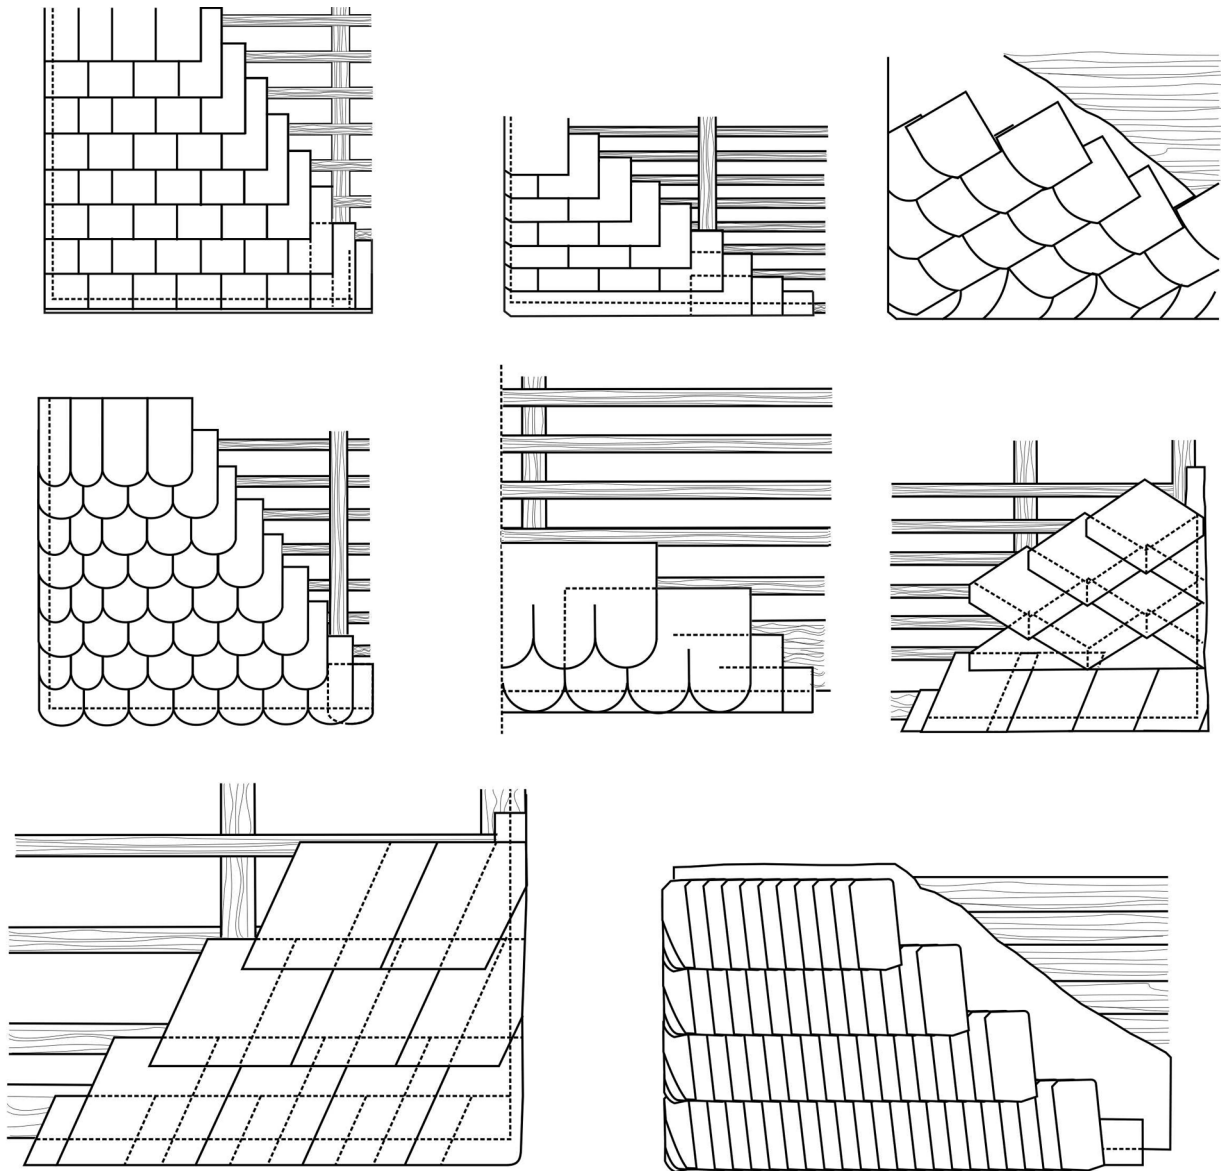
Examples of installed fibre-cement slates showing the line of fixing
